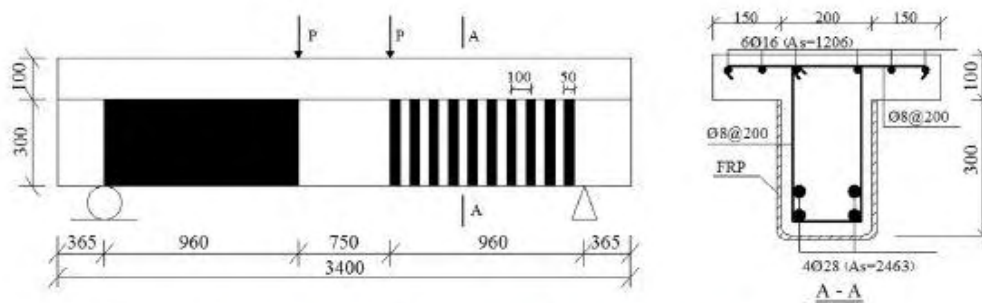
Details of beam specimens (units: length in mm; area in mm<sup>2</sup>).
